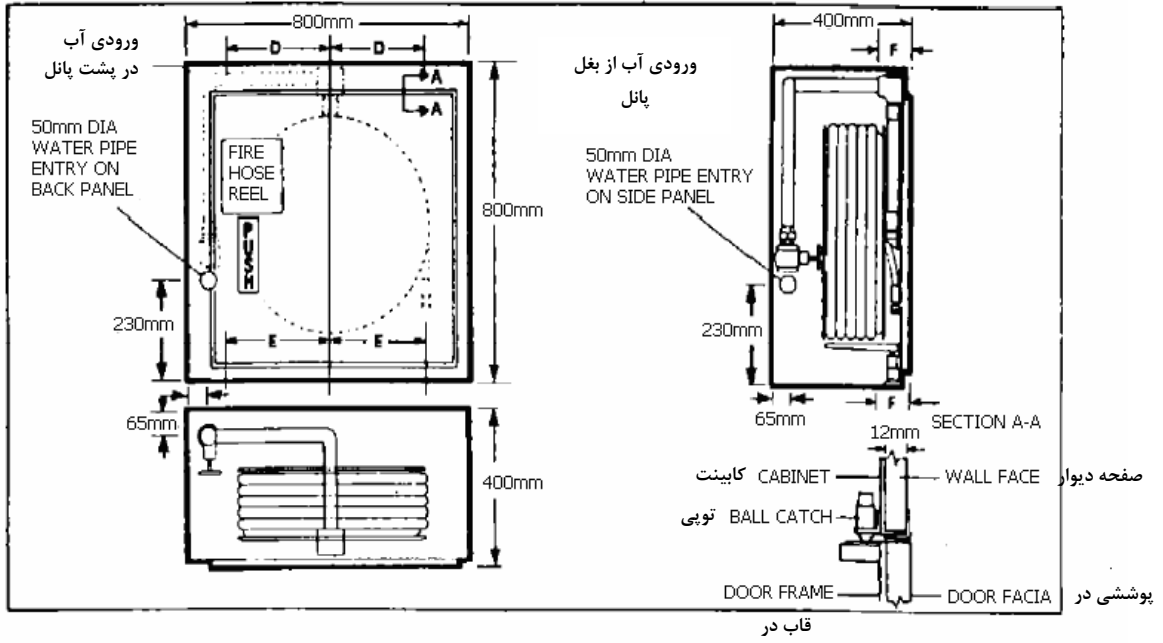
DOOR MOUNTED HOSE REEL CABINET
